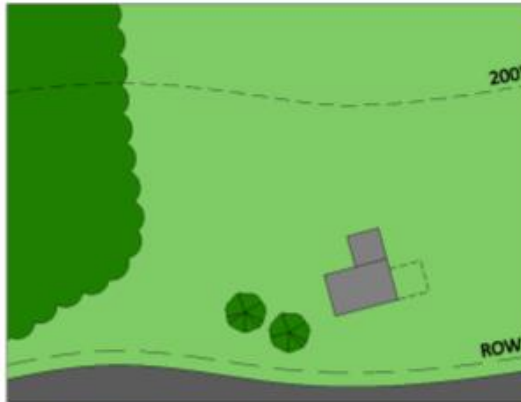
Addition to existing structure is placed to the rear of the building rather than directly in the viewshed
